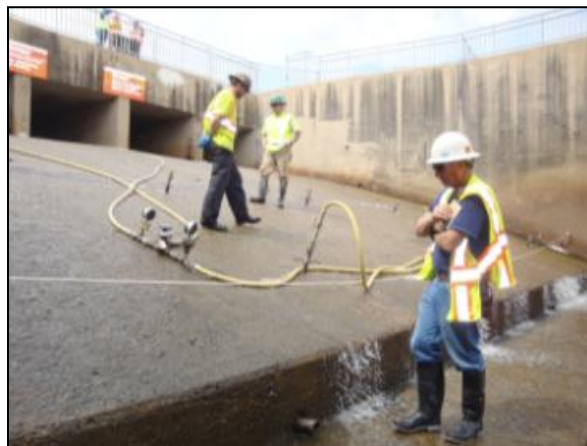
Backfill grouting operations to fill voids under the downstream parabolic spillway slab at Barker Dam outside of Houston, TX (Galveston District). Holes were drilled on 10-ft centers, and injection pressures were controlled by the manifold at the injection point. A circulating system was used to verify the volume of voids being filled with cementitious grout.
